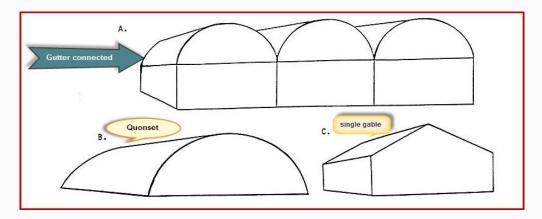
Commercial greenhouse structures: A) gutter connected, B) Quonset, and C) single gable.
